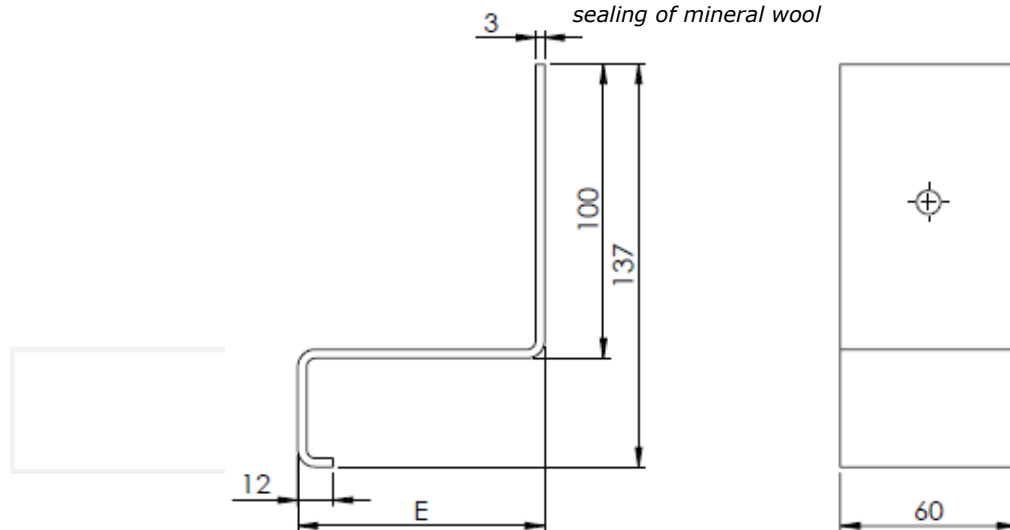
Proposed dimensions of mounting brackets for installation in a ceiling
